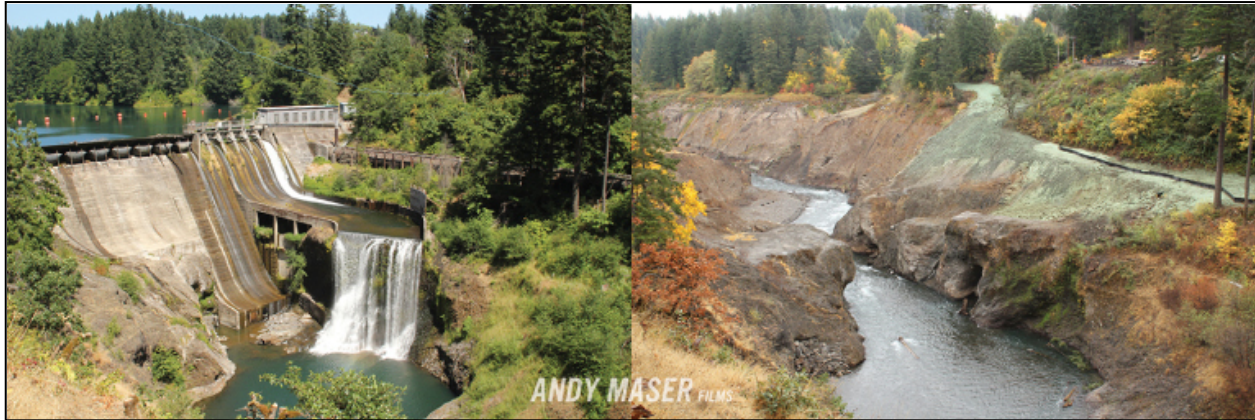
Before and After Photos of the Condit Dam Removal (Courtesy of Andy Maser and Steve Stampfli)
